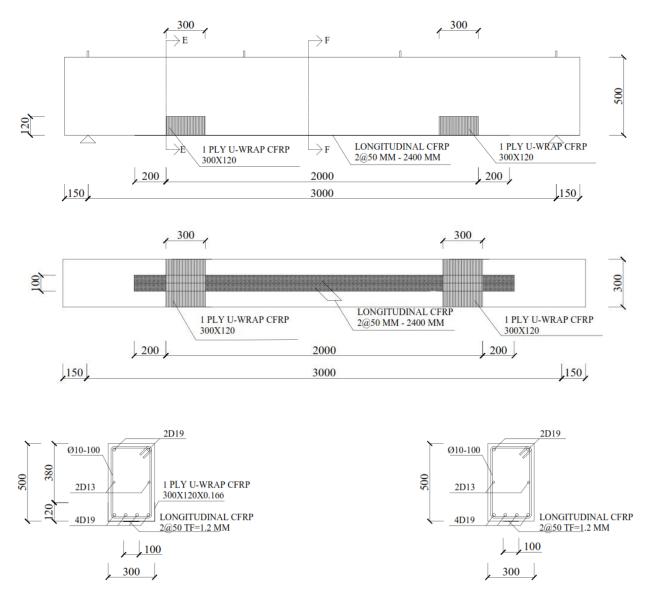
Cross section of BU-500 beam; (a) Details of Installation Placement of *Longitudinal* FRP and FRP *U-Wrap* (b) Detail of Cross-section with FRP *Longitudinal* and FRP *U-Wrap
